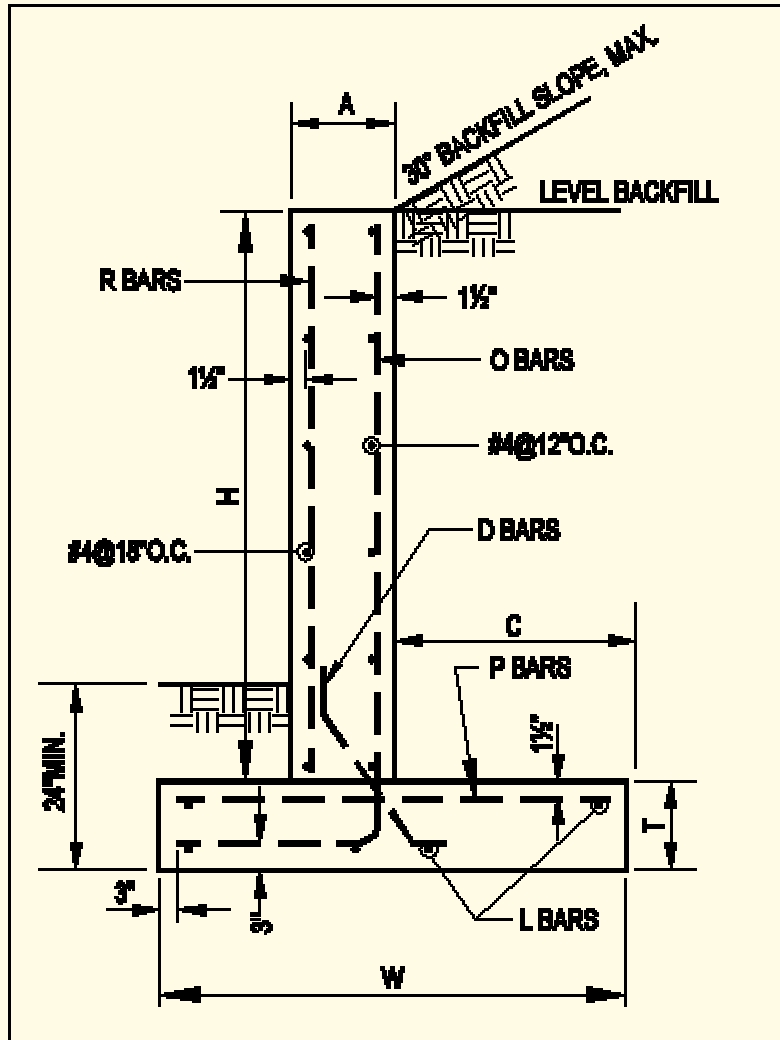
TYPICAL CONCRETE WALL SECTION
